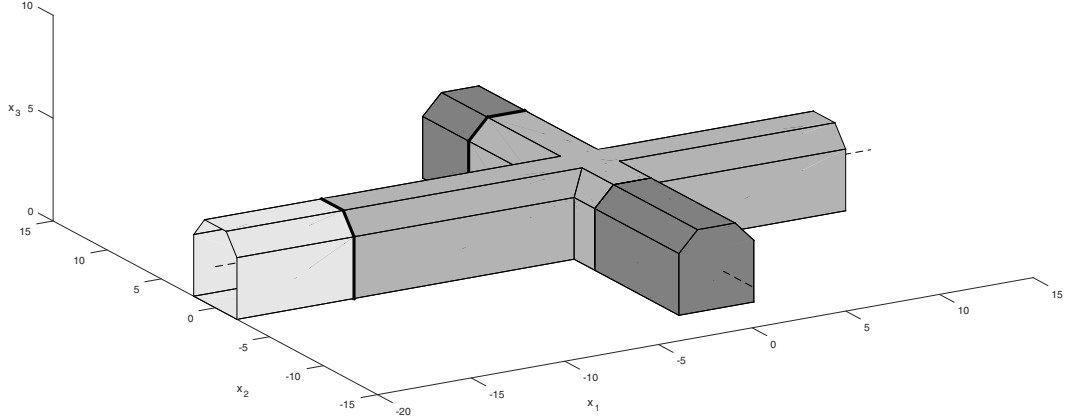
Detail of underground opening with highlighted three steps of the excavation process.
